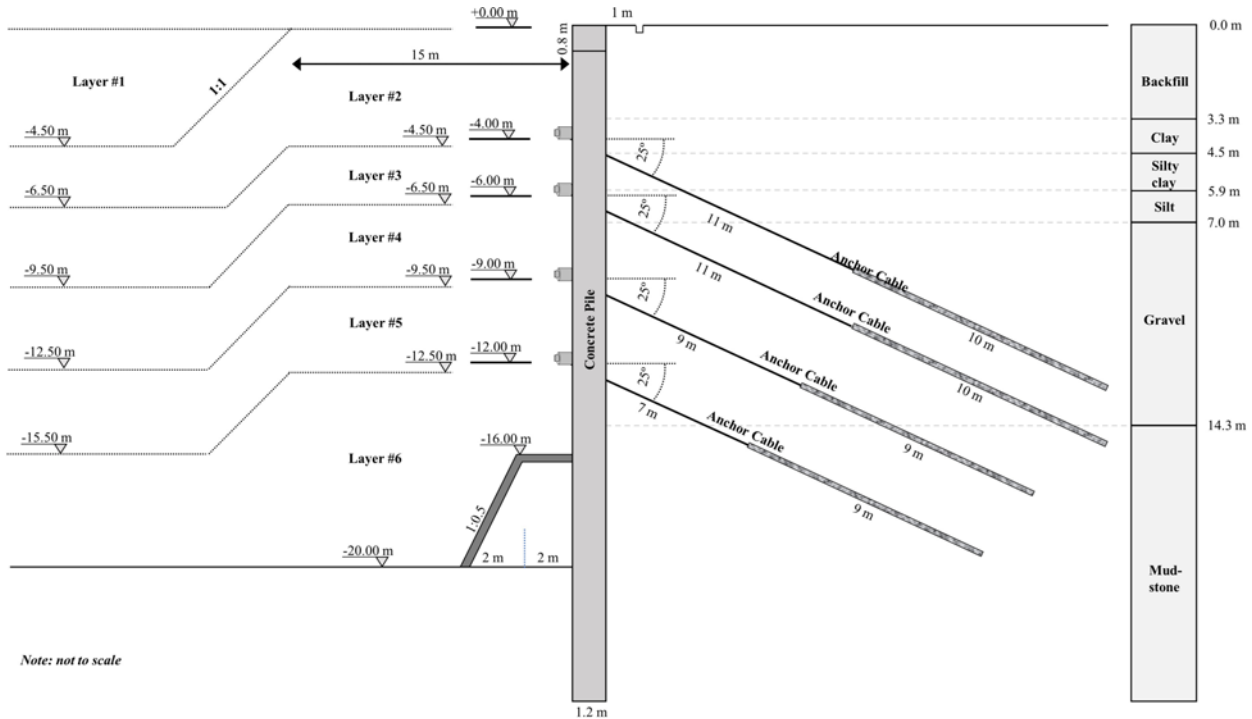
Typical Cross Section of the Rectangular Pit and Corresponding Soil Types (section 3-3 in Fig. 1)
